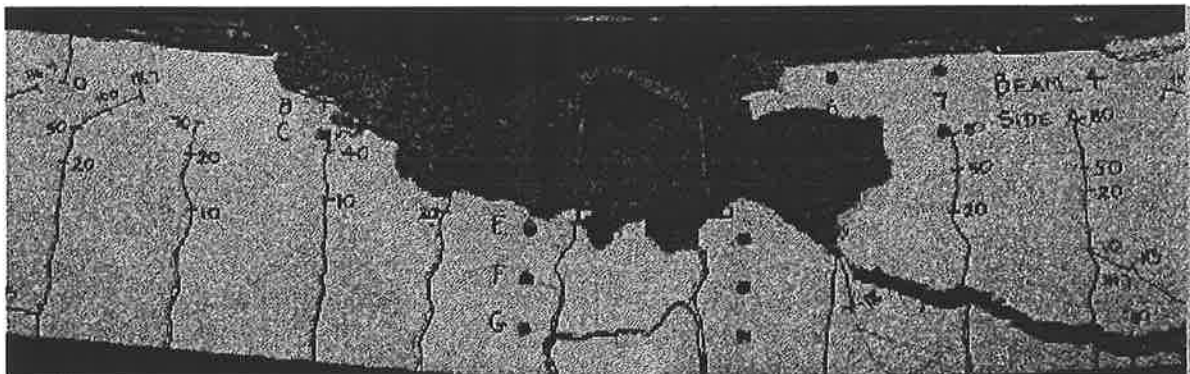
Discovering of the steel rebar at the top of beam 4.
